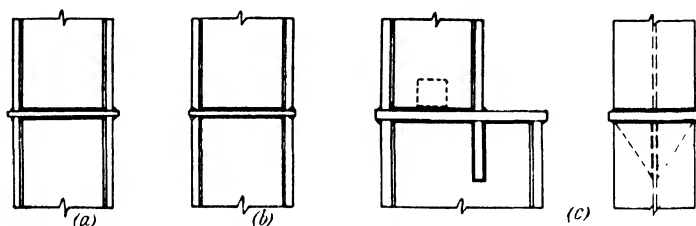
TYPICAL WELDED STANCHION SPLICES
